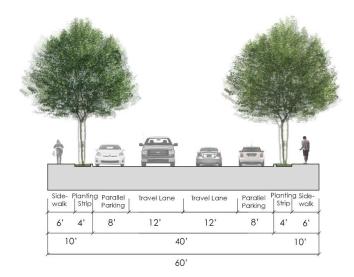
North Pioneer Street Section as seen in the Downtown Master Plan
